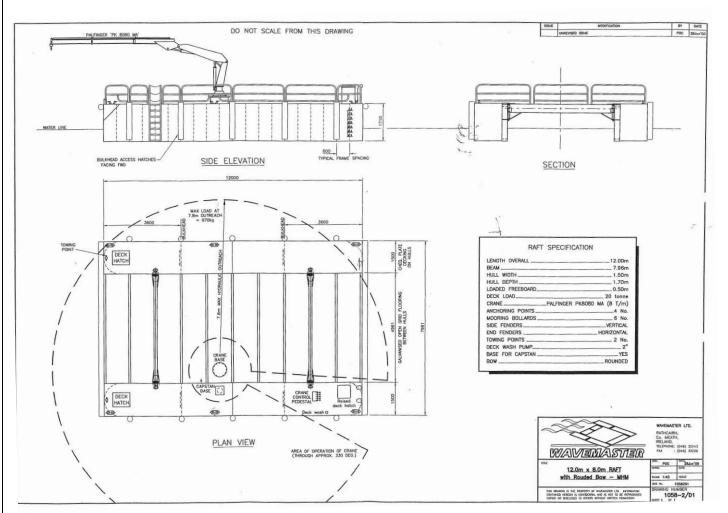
EXISTING & PROPOSED: Plans of a typical Wavemaster Raft
